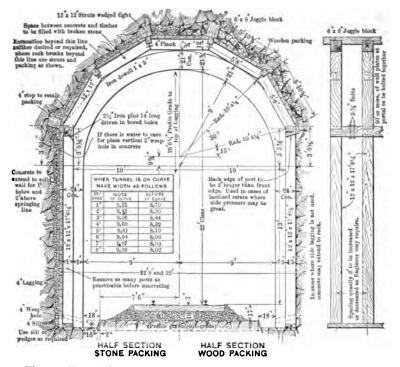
Tunnel Concrete Lining Inside of Timbering, C. C. & O. Ry.
